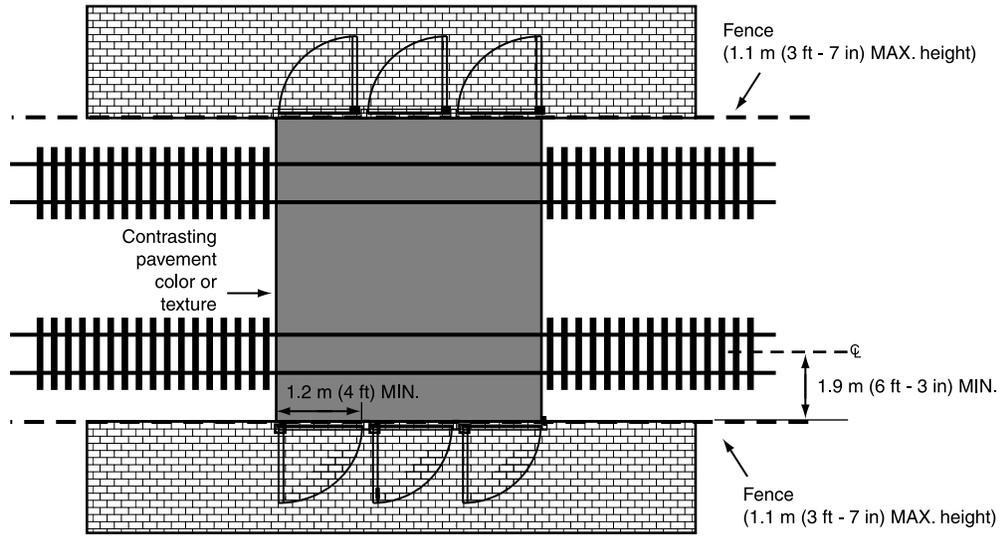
D-7. Typical Pedestrian Barriers at an Offset Highway-Light Rail Transit Crossing
